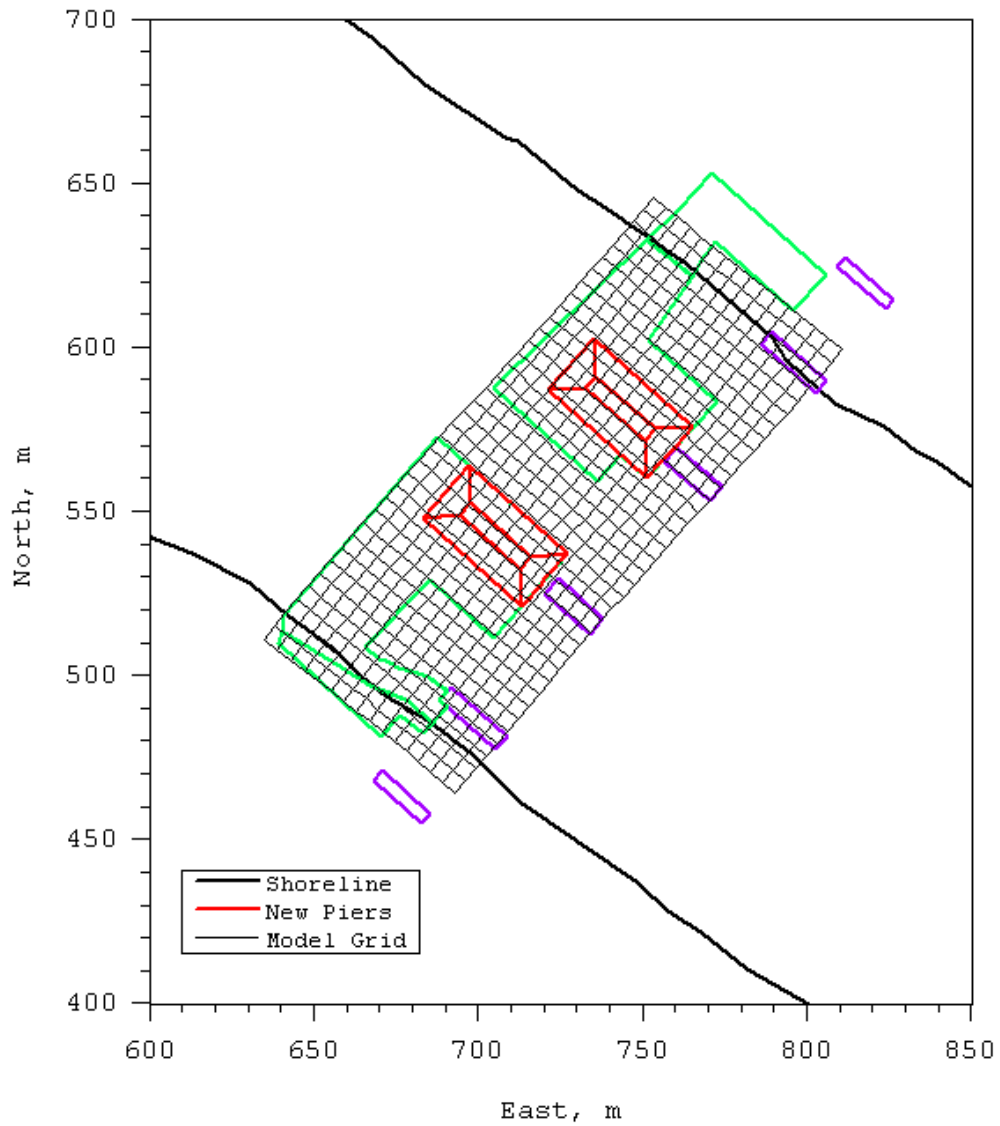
River shoreline and features associated with the existing bridge, construction activities, and new bridge. Existing bridge piers, blue, will remain in place. New piers and their riprap footprint are show in red. Temporary work bridge shown in green.
